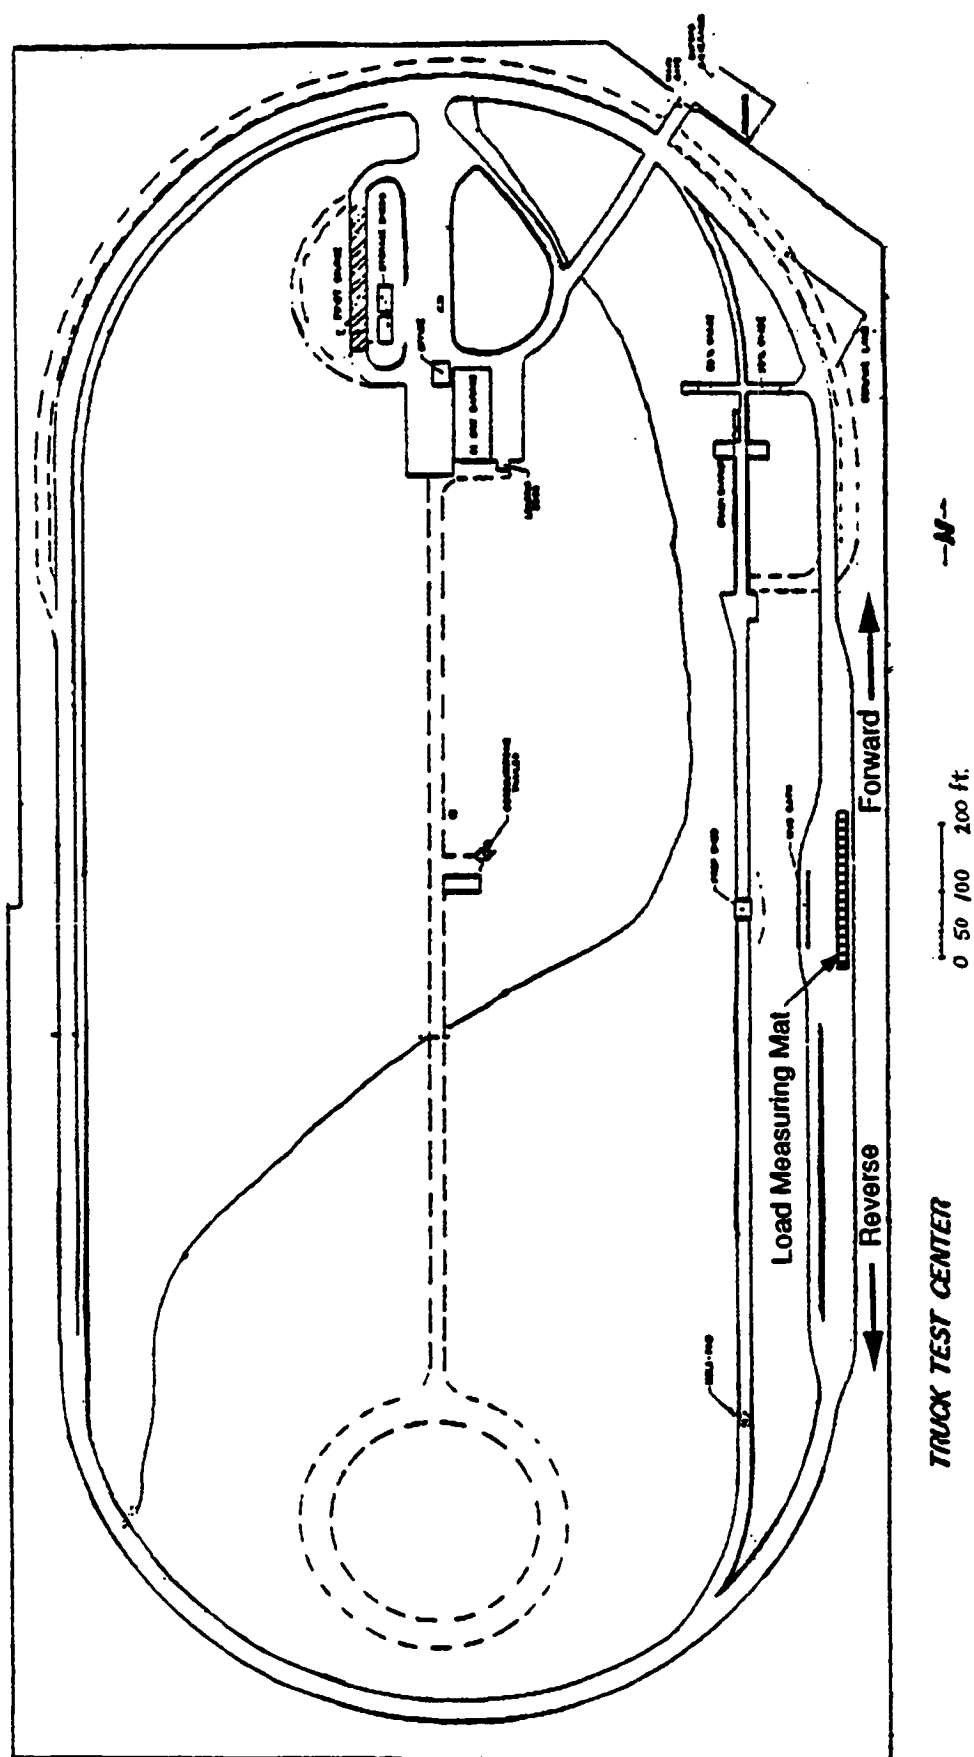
Plan of the Navistar Test Track, showing the site of the mat installation.
